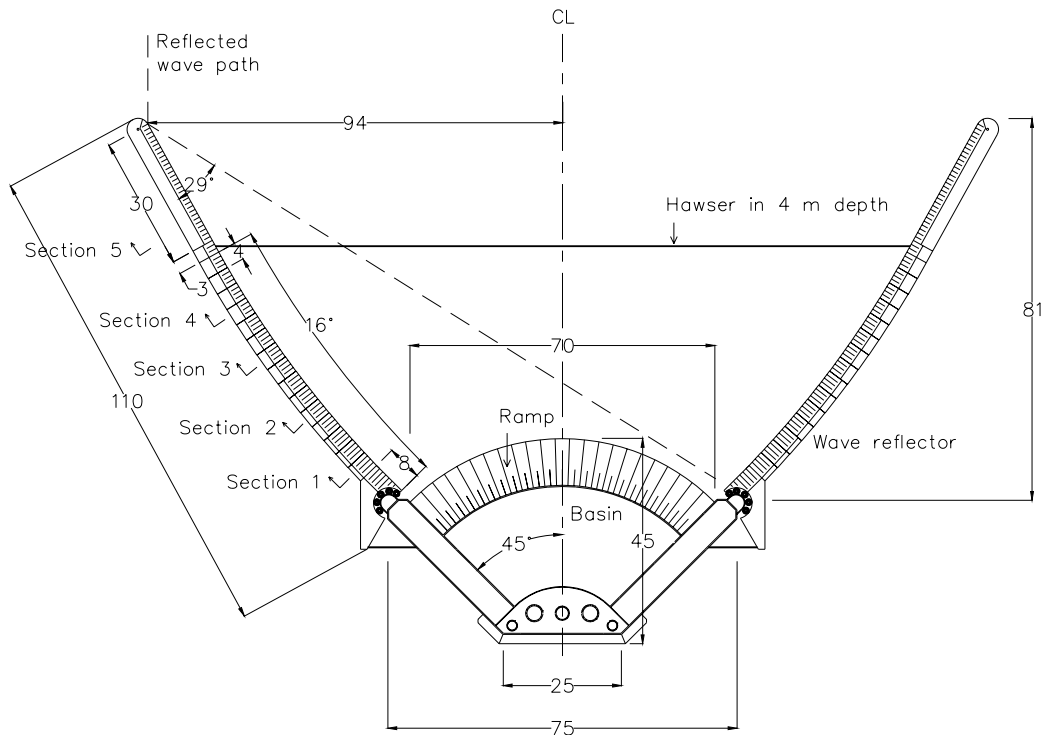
Plan view of the Wave Dragon as proposed by EFM. All measures are in m. The cross sections 1 – 5 are shown in Figure 1.6. An elevation of a wave reflector is shown in Figure 1.7.
